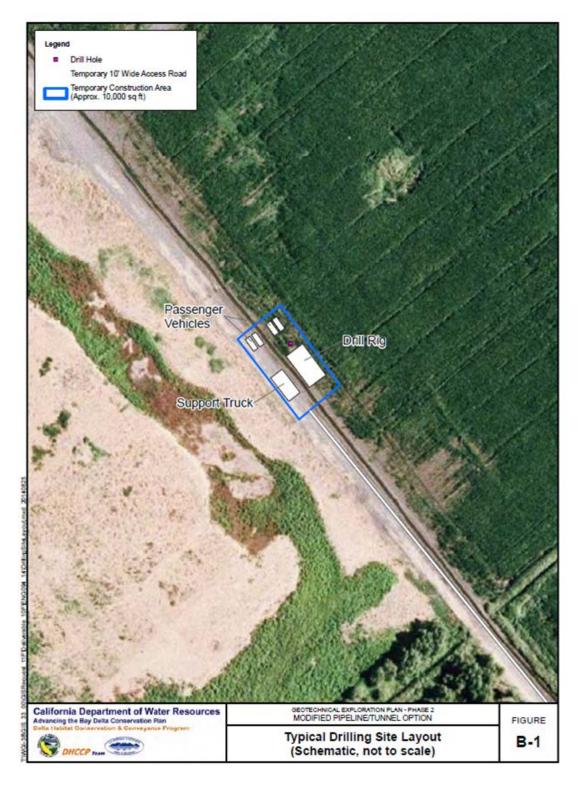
B-1. Example of a Typical Geotechnical Exploration Site
